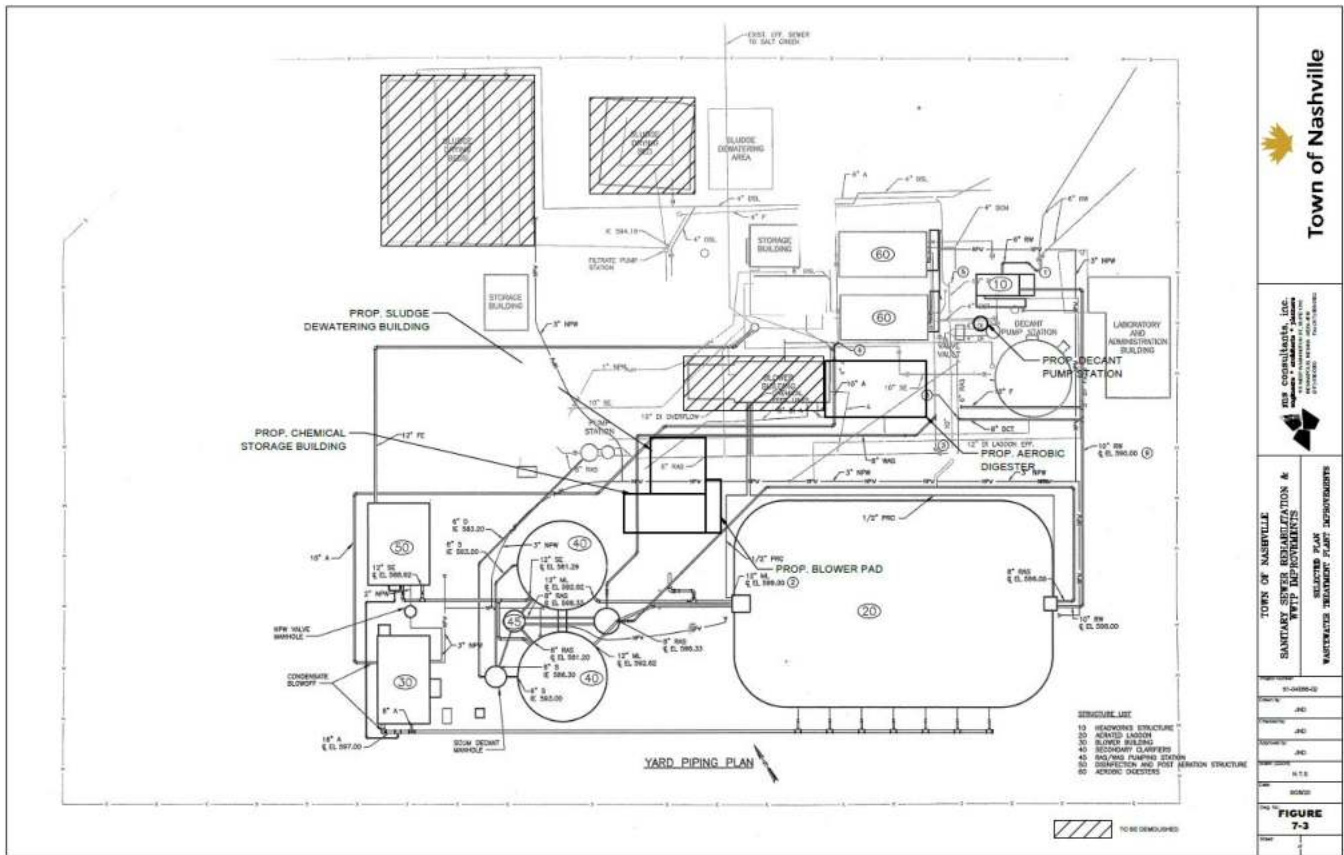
Selected Plan: WWTP Sludge Improvements
